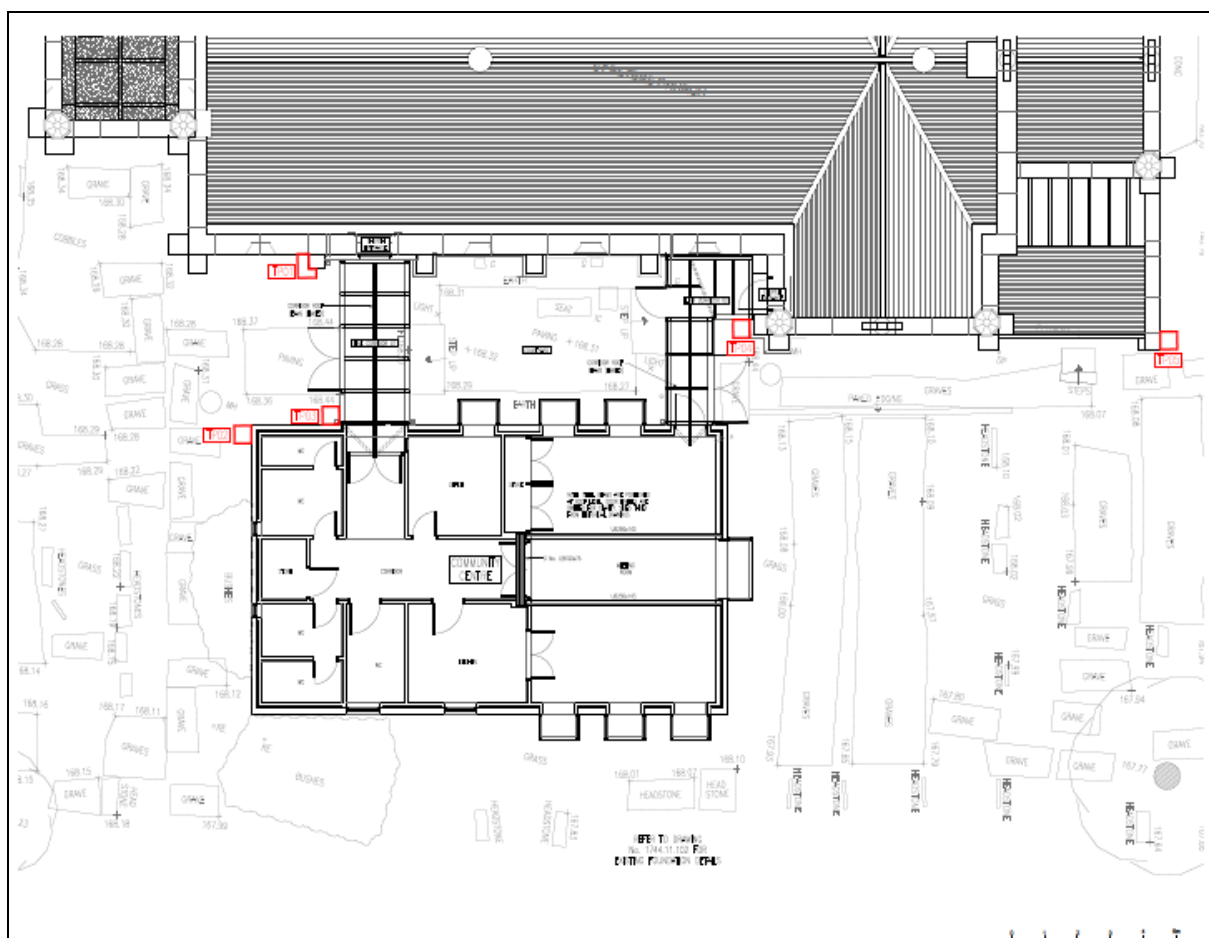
Plan of test pits produced by Bradshaw, Gass & Hope LLP. Test pits shown in red
